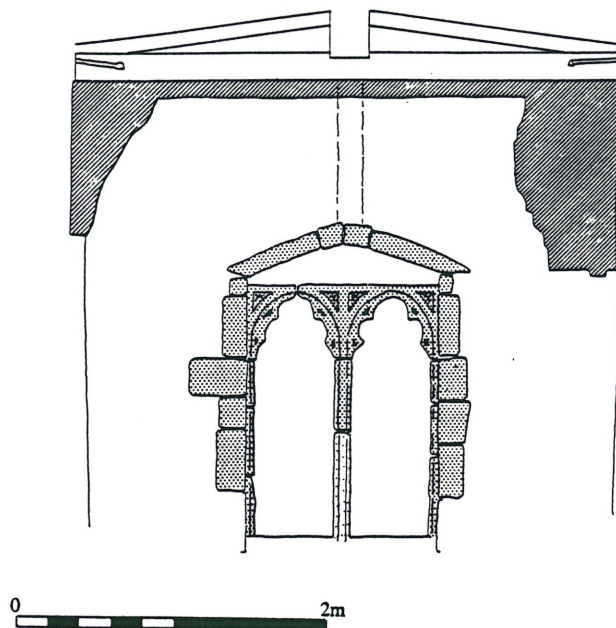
West wall internal elevation (Drawing by A. Baggs)
